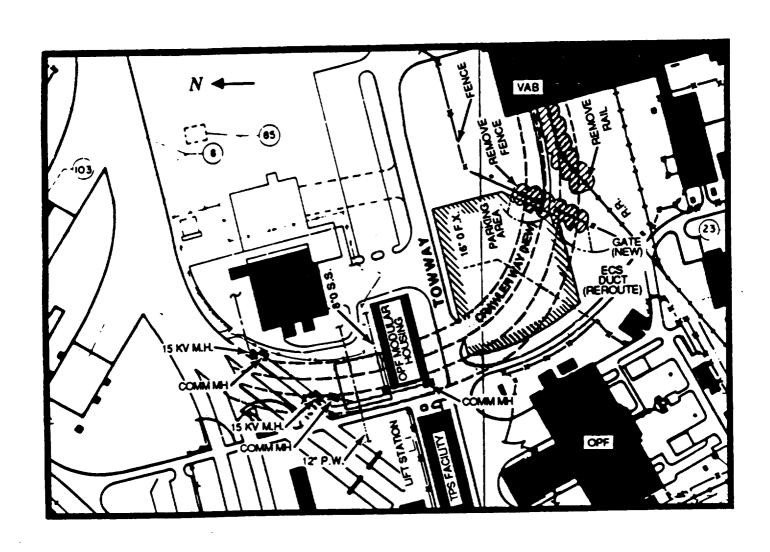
VAB High Bay 4 Crawlerway Site Plan.
